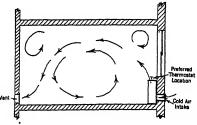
Section Through a Unit Venti-Lator-Equipped Room when Heating
